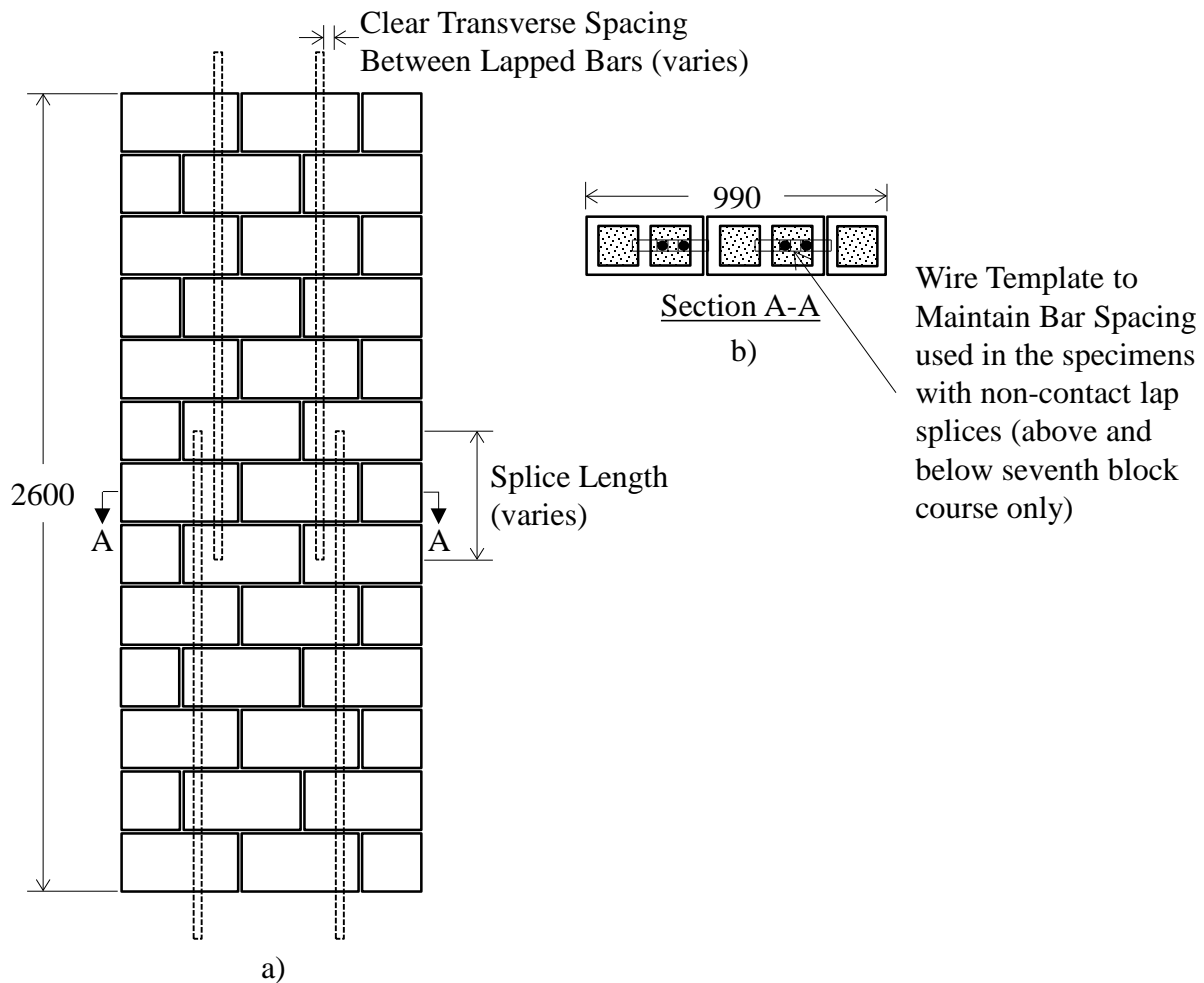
Wall splice specimens: a) elevation, and b) cross-section within the lap splice length.
